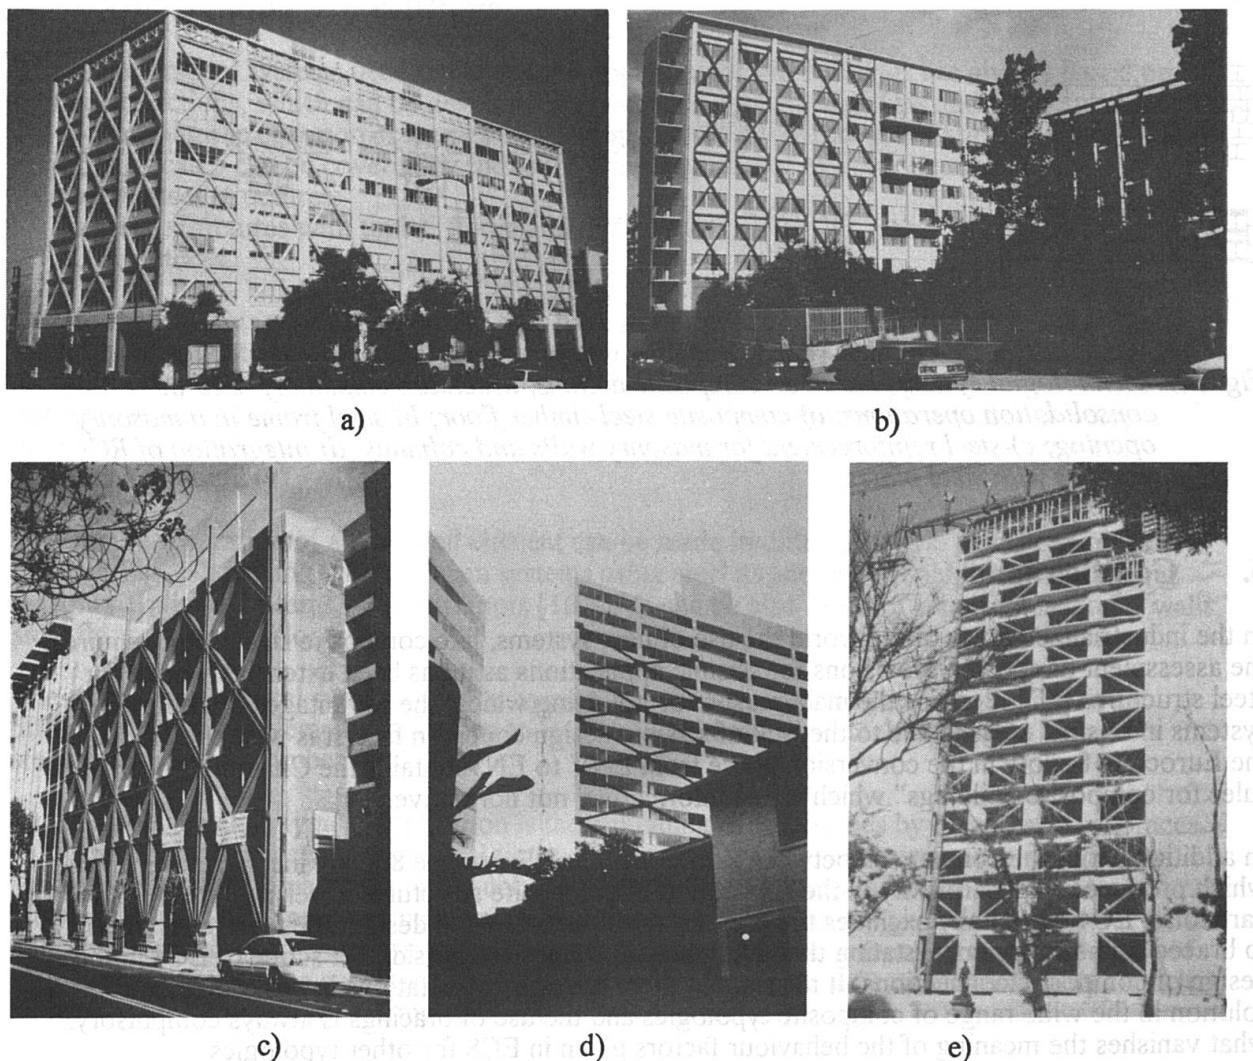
Seismic upgrading of RC frames by means of steel bracings: a), b), c) Berkeley; d) Santa Monica - Los Angeles; e) Mexico City.
